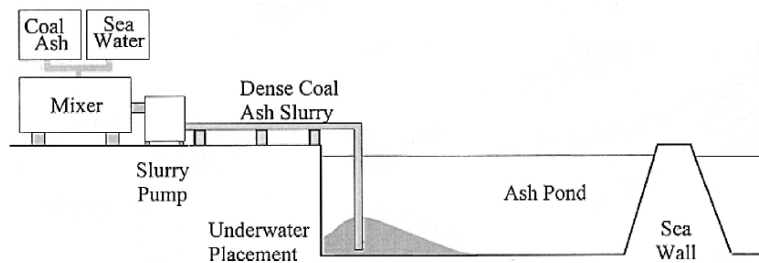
Concept of slurry reclamation for pond ash (Horiuchi et al. 2000).
